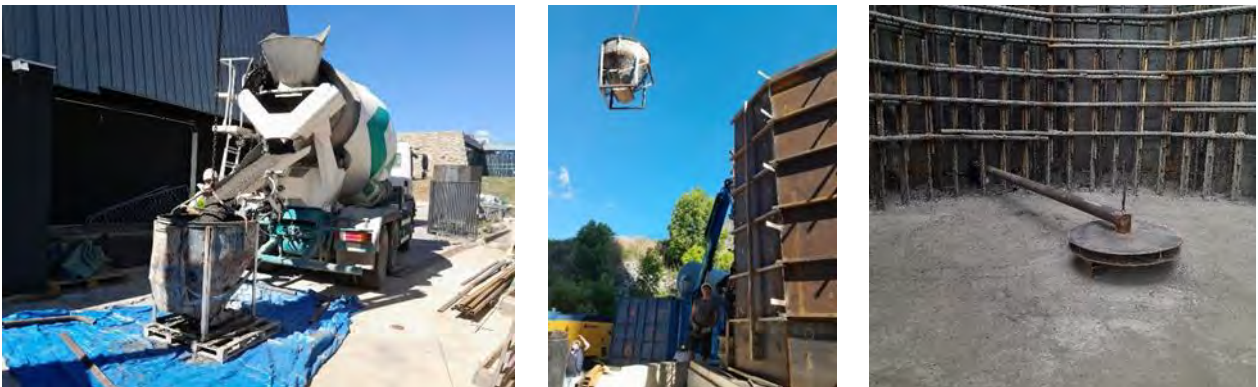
Construction of bottom slab in concrete [11/07/2022]
